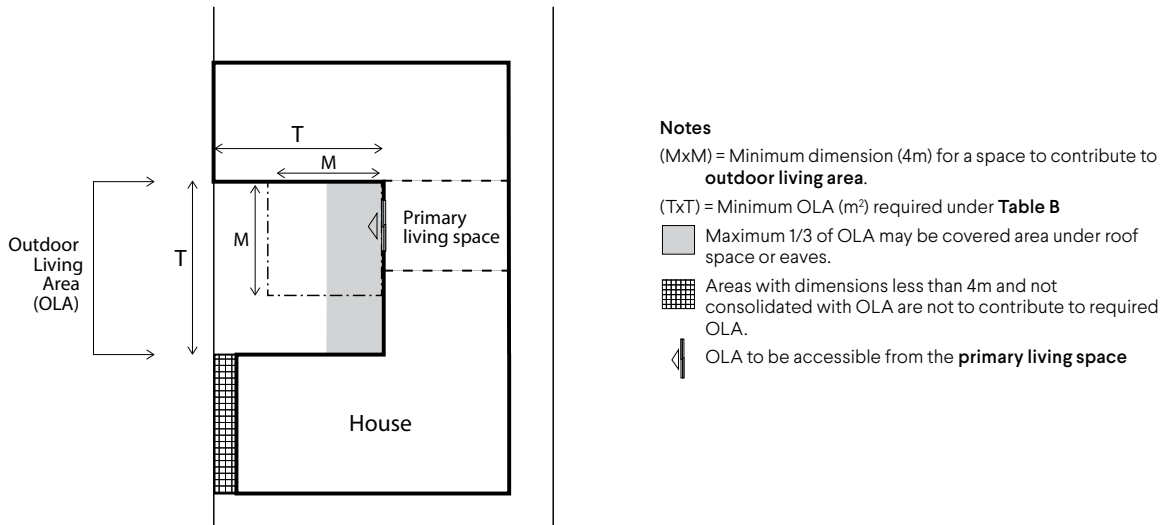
Dimensions and calculations for outdoor living areas (clause 5.3.1 C1.1)
